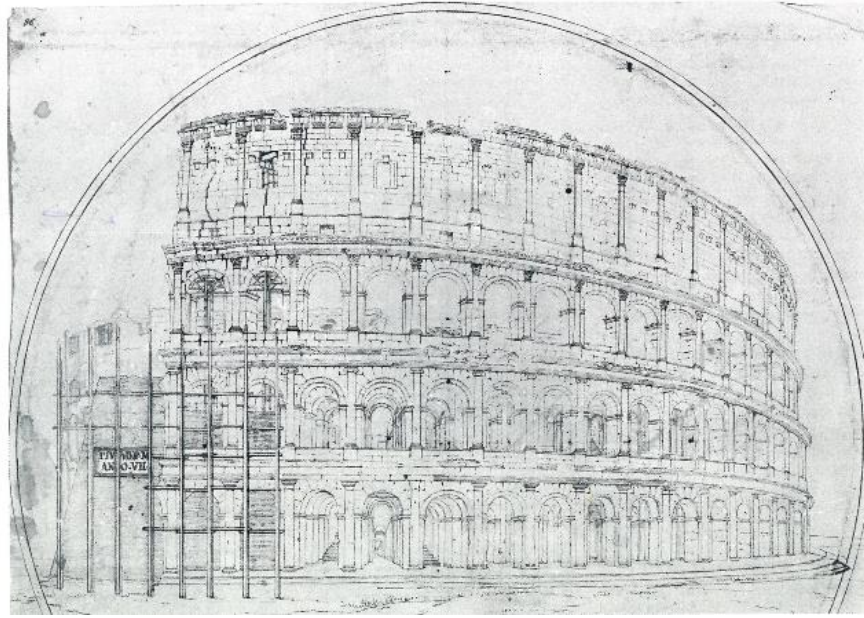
Timber shoring in the south-east wall in 1806-1807 (Uggeri 1809)
